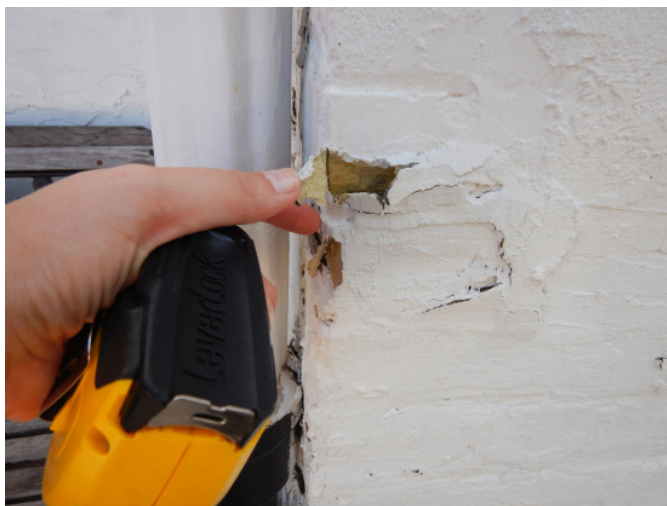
D-66 Buff colored brick spalling where coating is peeling off of exterior surface of wall.
